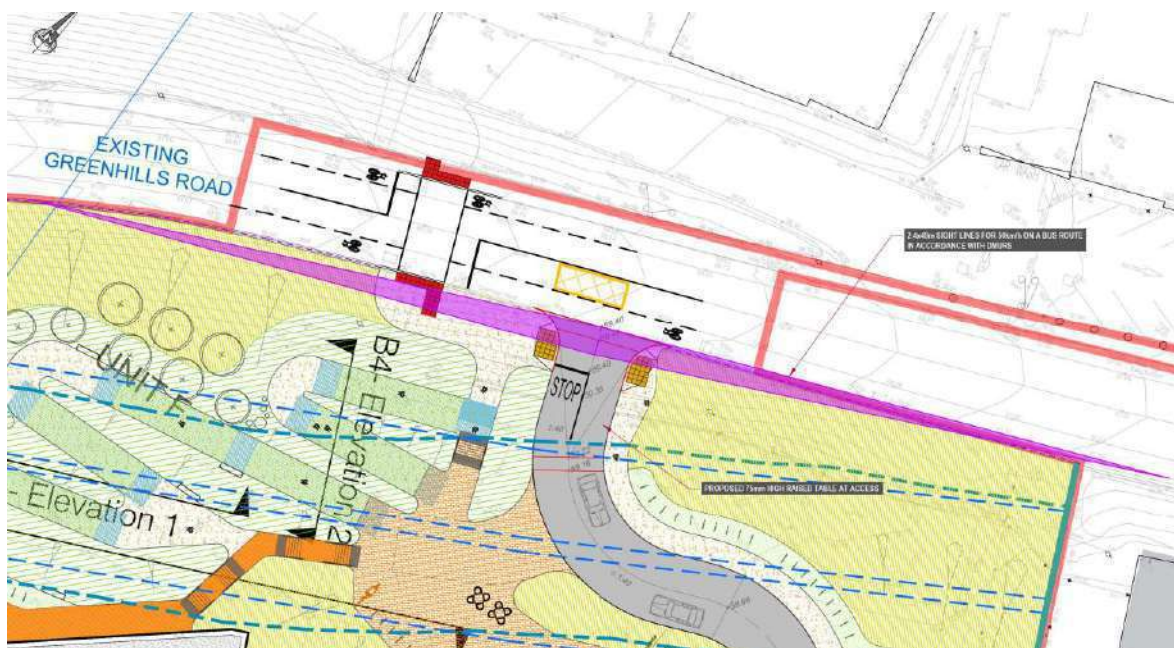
Proposed Greenhills Road Site Access Junction (NRB-TA-002)
